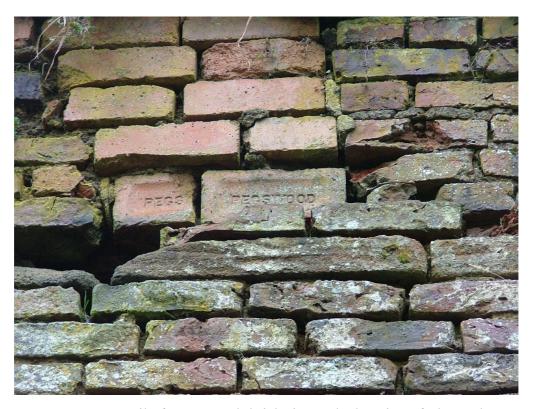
Detail of 'Pegswood' bricks in south elevation of The Bothy
